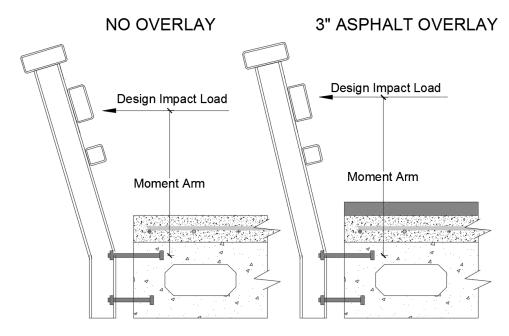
Steel Post Plastic Hinges at Elevation of Tension Anchor Rods
